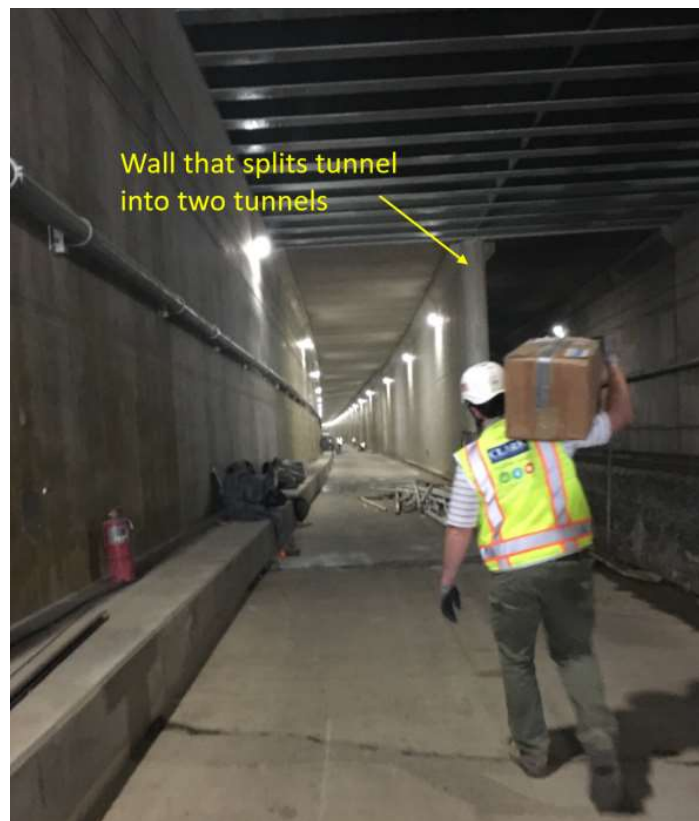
Partially obstructed view of the beginning of the wall where the tunnel splits into two tunnels
